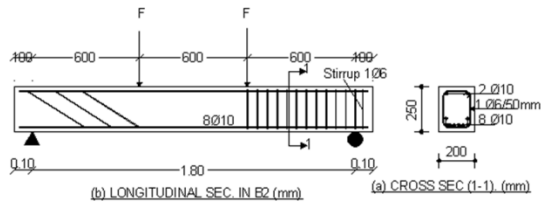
Steel reinforcement used in beam B2, B3, and B4.
